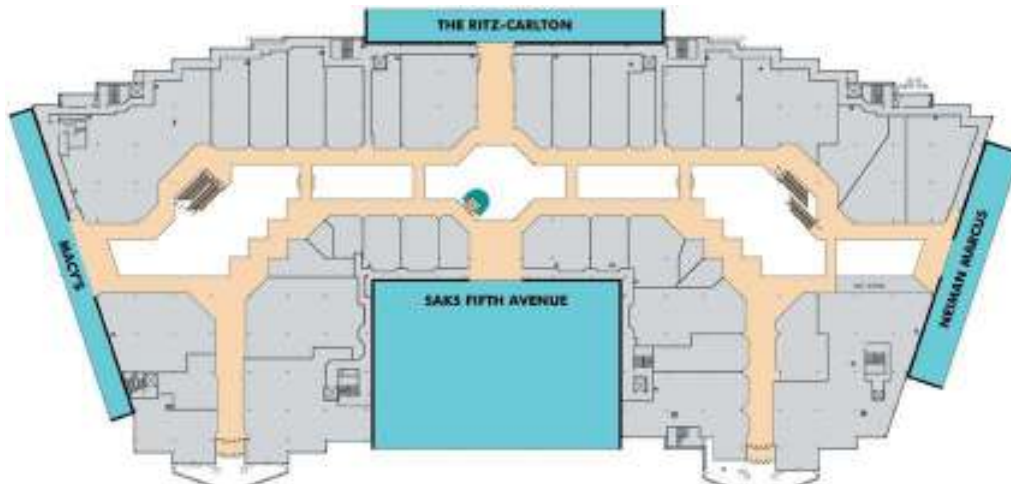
First Floor Plan of Tyson Galleria, Virginia United State
